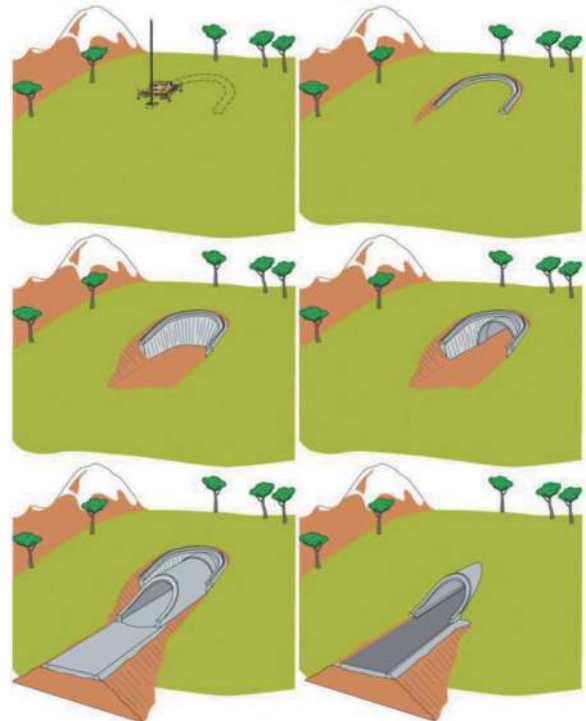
Tunnel portals with shell of improved ground by means of vertical jet-grouting (Lunardi, 2008).
